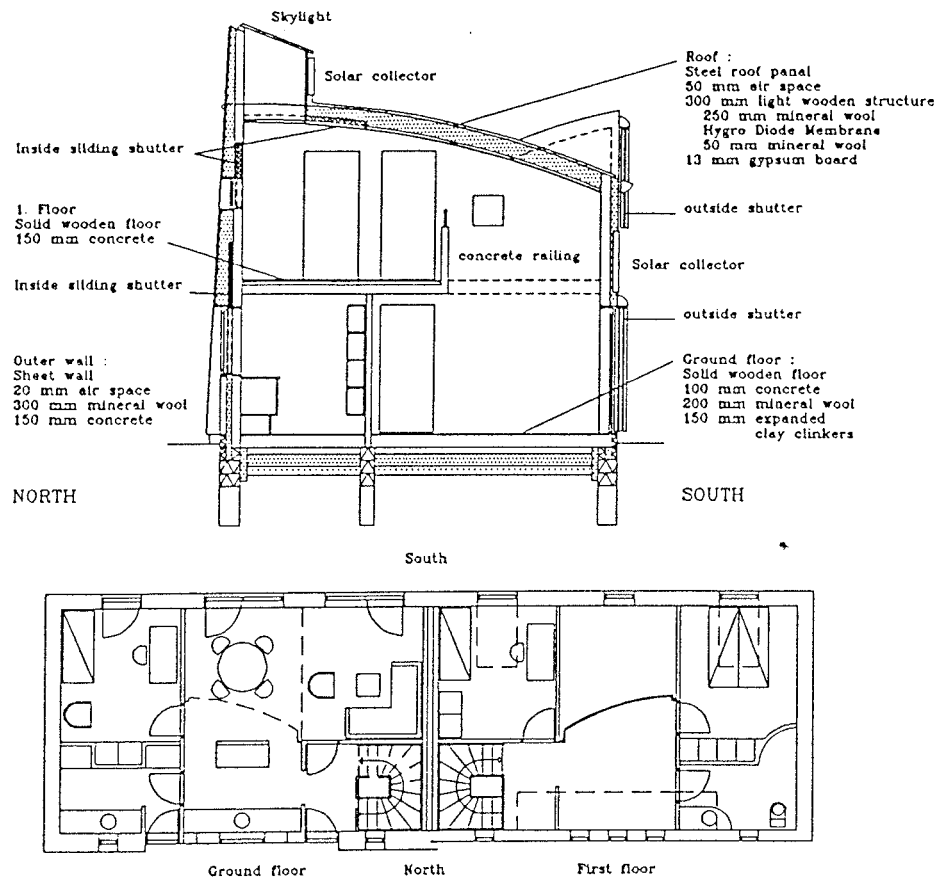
Plan and section of House type A. The plan shows 2 dwellings of a longer row, the ground floor of one unit to the left, and the top floor of the neighbour unit to the right.
